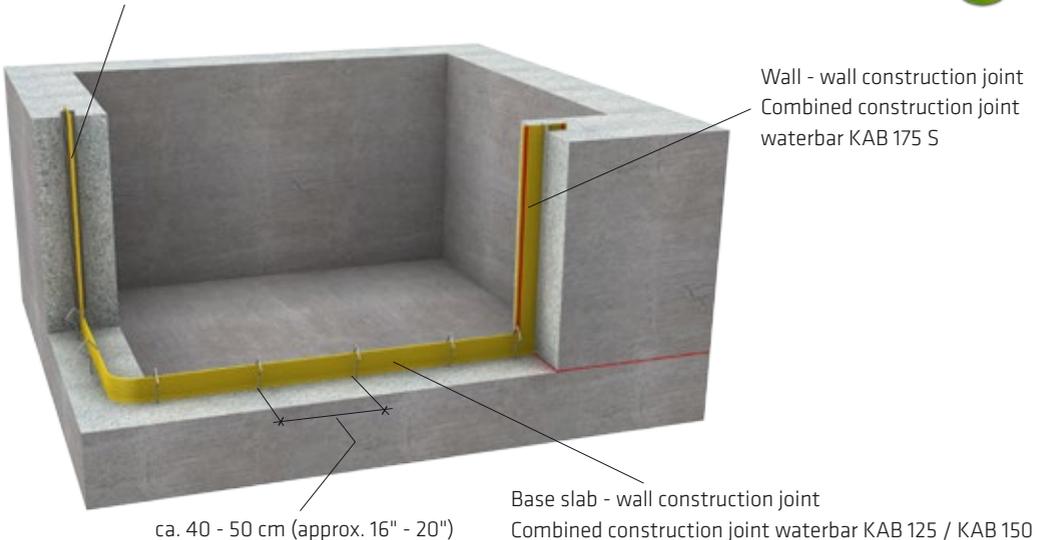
Uses of Sika® KAB combined construction joint waterbars in construction joints and induced crack sections
